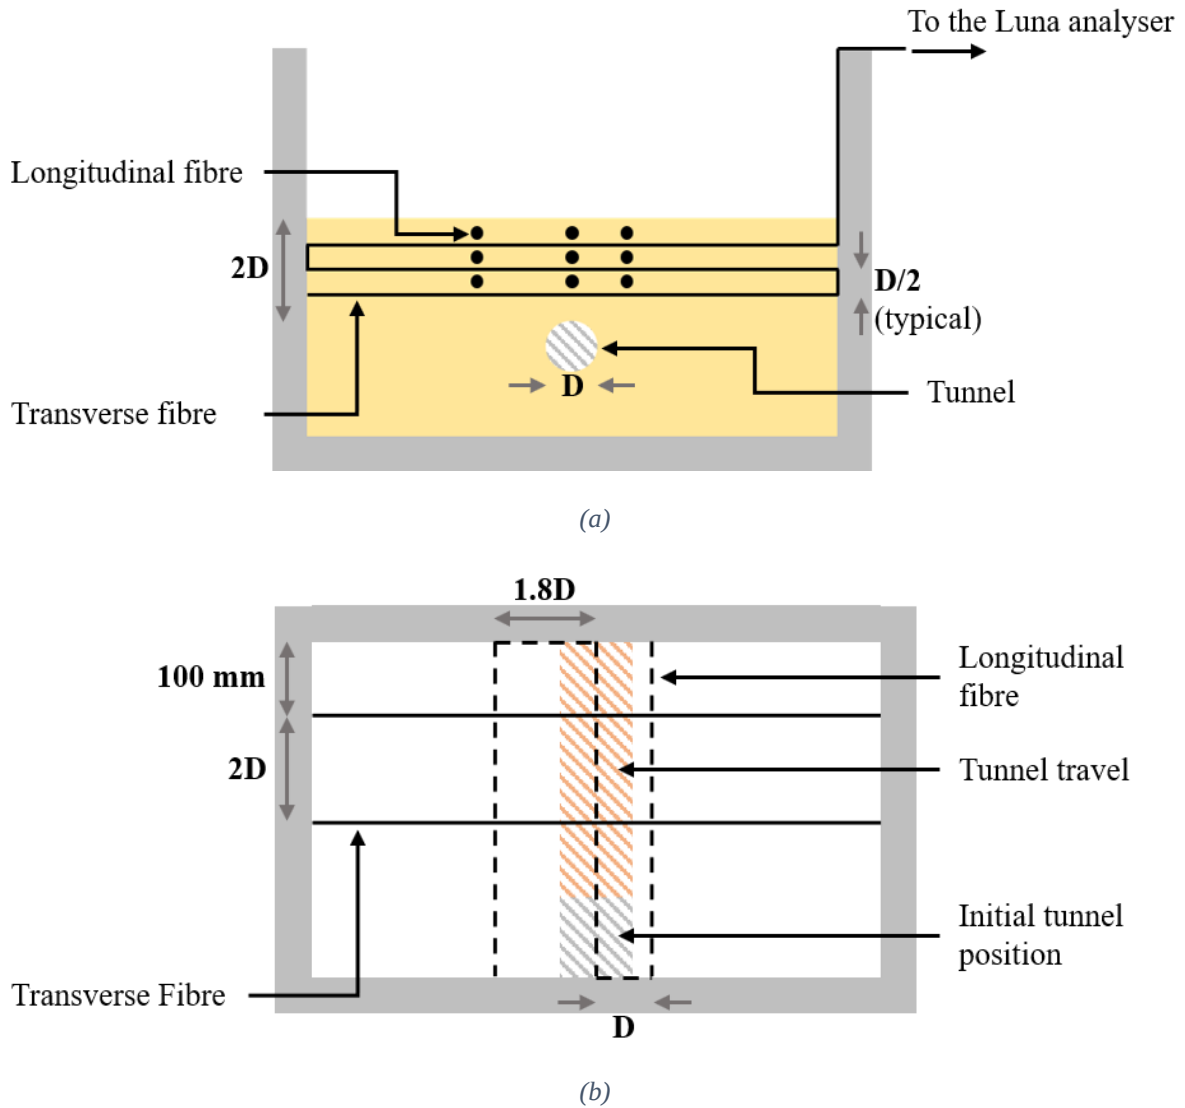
An elevation (a); and a plan (b); view of the tunnelling fibre layout.
